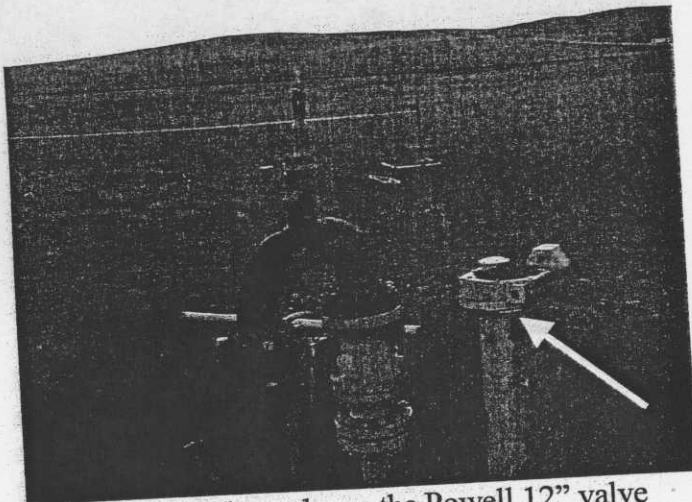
This photo shows the Powell 12" valve pedestal (arrow) with the wheel broken off. The intersecting Powell unit feeder gas pipeline and valve are located to the left of the pedestal.
